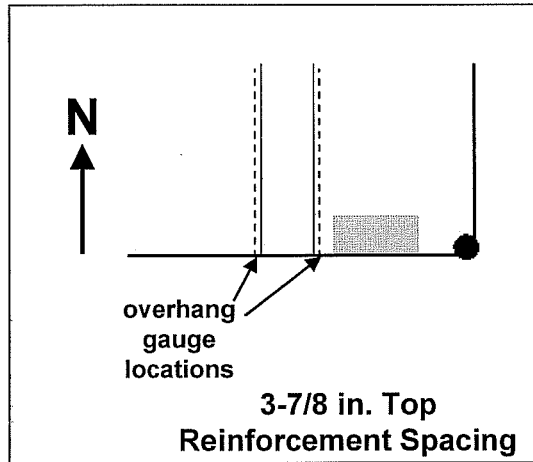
Overhang Test Area 1, 3-7/8 in. top reinforcement spacing
